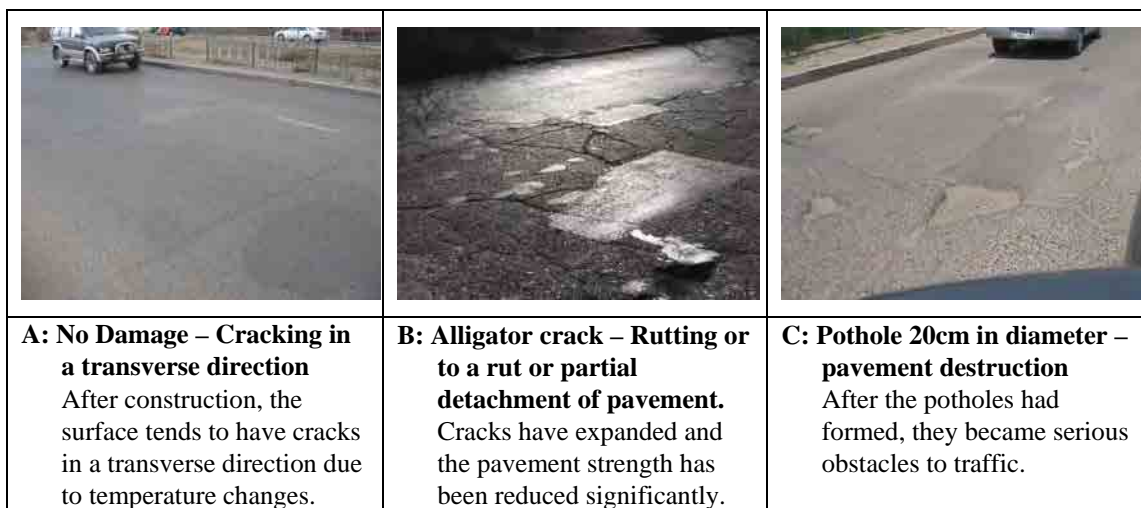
Typical Pavement Damages in Ulaanbaatar City
